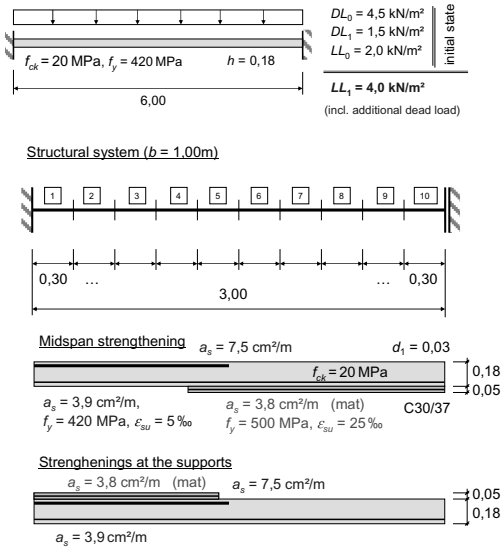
Strengthening of a slab: geometry, loads and structural systems.
